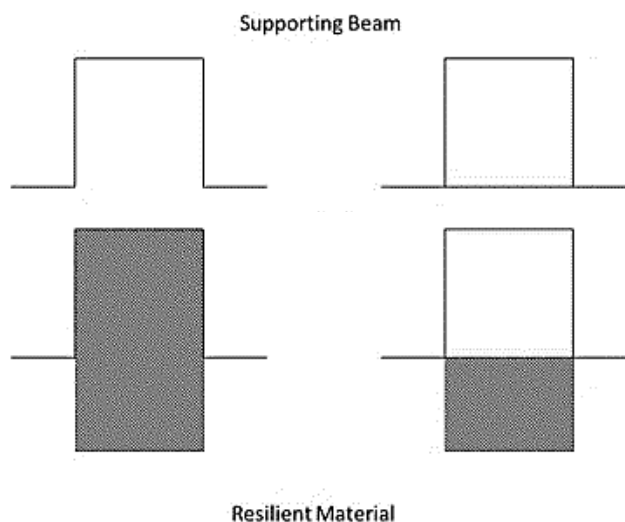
Typical floating floor grillage considered as case study, with a detail of the beam section
